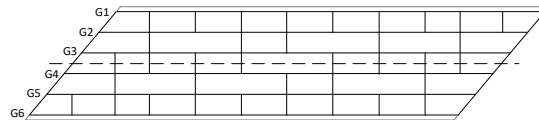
Modified staggered cross-frame arrangement of Bridge 18 satisfying AASHTO LRFD C6.7.4.2 recommendations.
